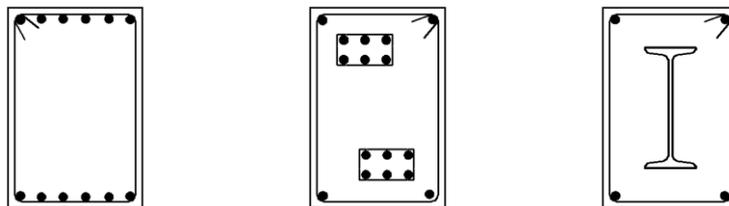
Reinforced concrete coupling beam alternatives (a) conventionally reinforced, (b) diagonally reinforced and (c) steel-reinforced coupling beam
